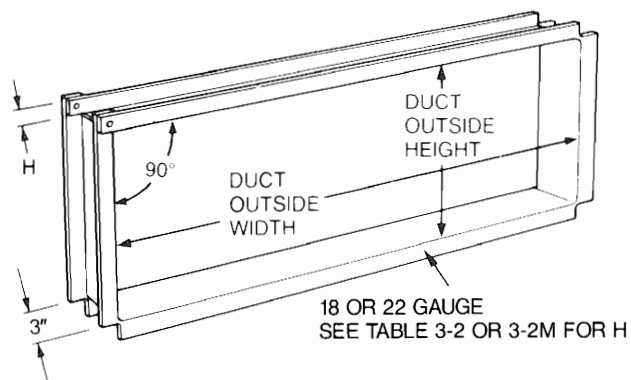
CHANNEL REINFORCEMENT, AT JOINTS ON DUCTS WITH WIDTH LESS THAN 48"
